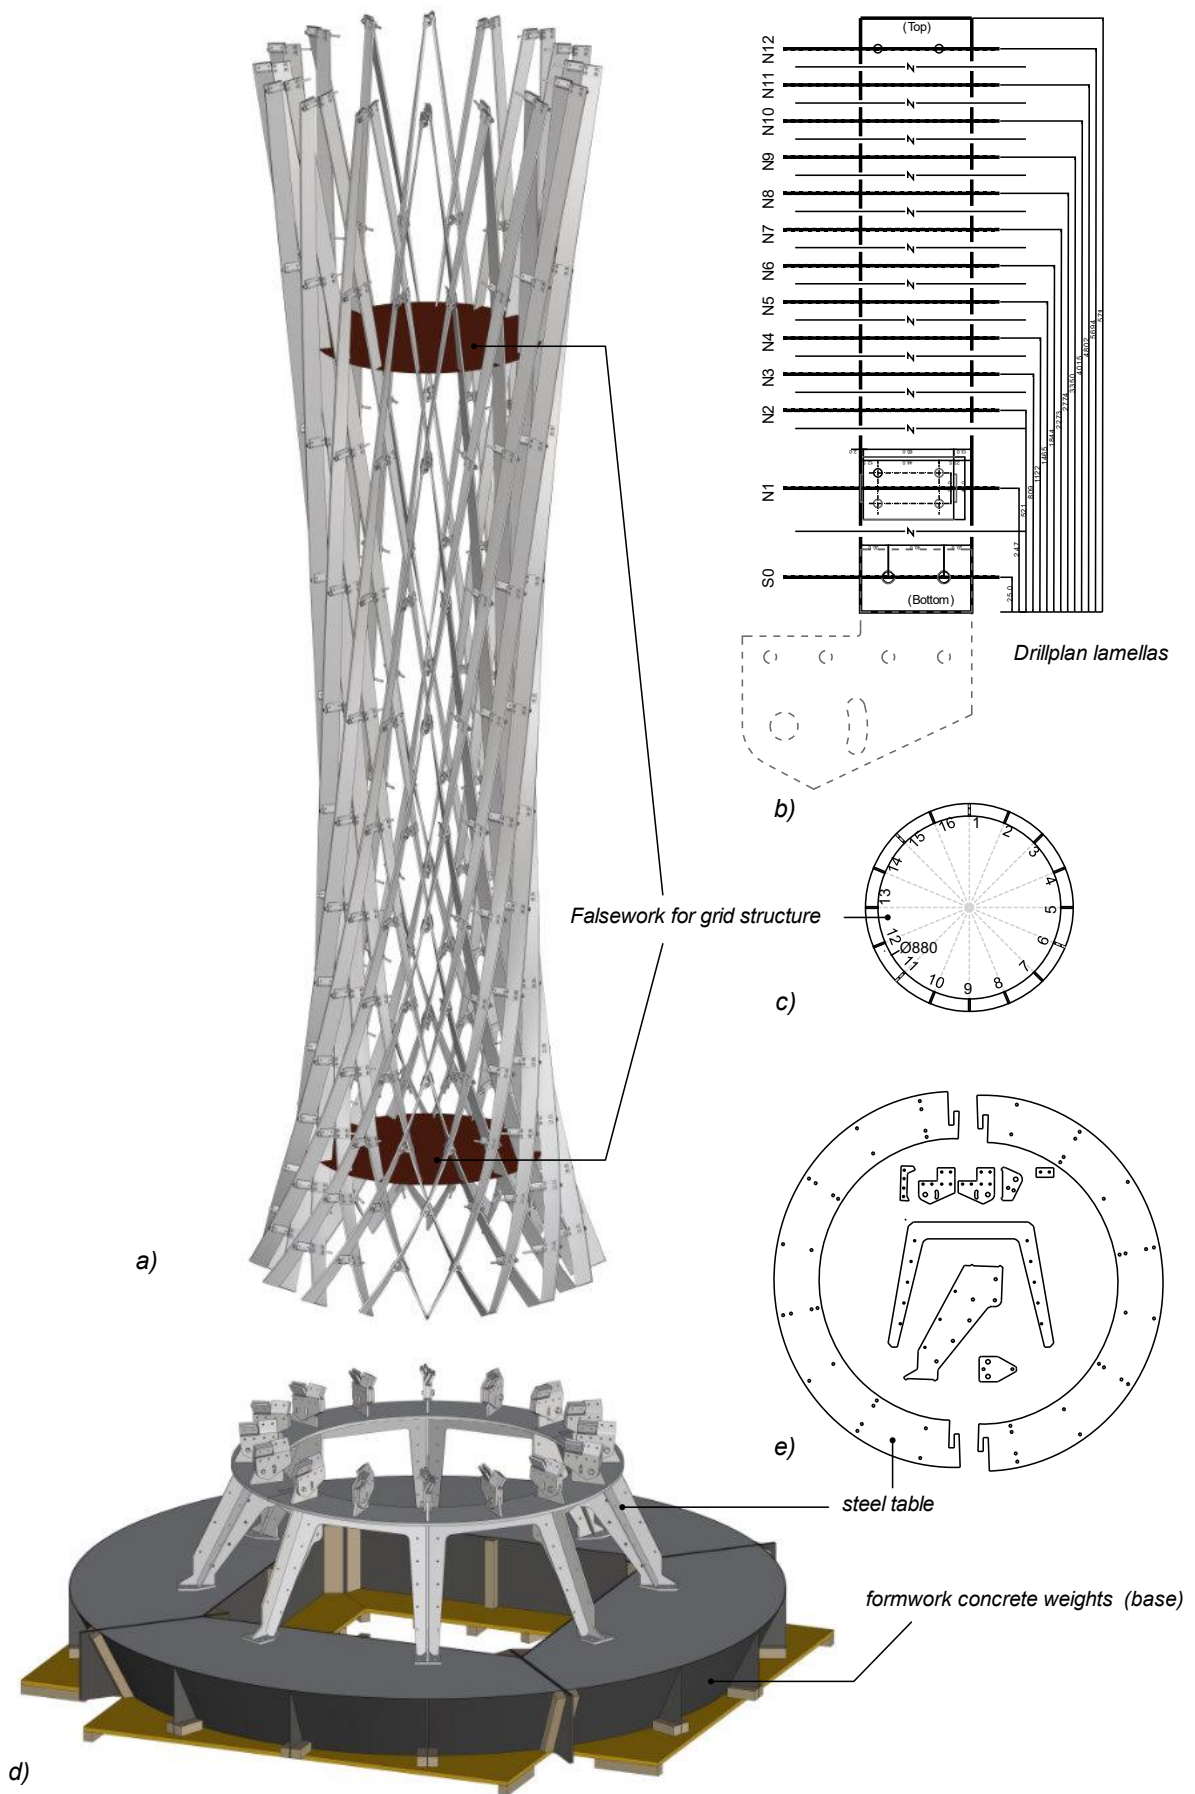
Overview on key construction plans: a) Grid structure in state for horizontal assembly, b) Drill plan for lamellas, c) Saw plan falsework for grid assembly, d) Concrete formwork and steel table detail, e) Data for laser cutting (steel base)
